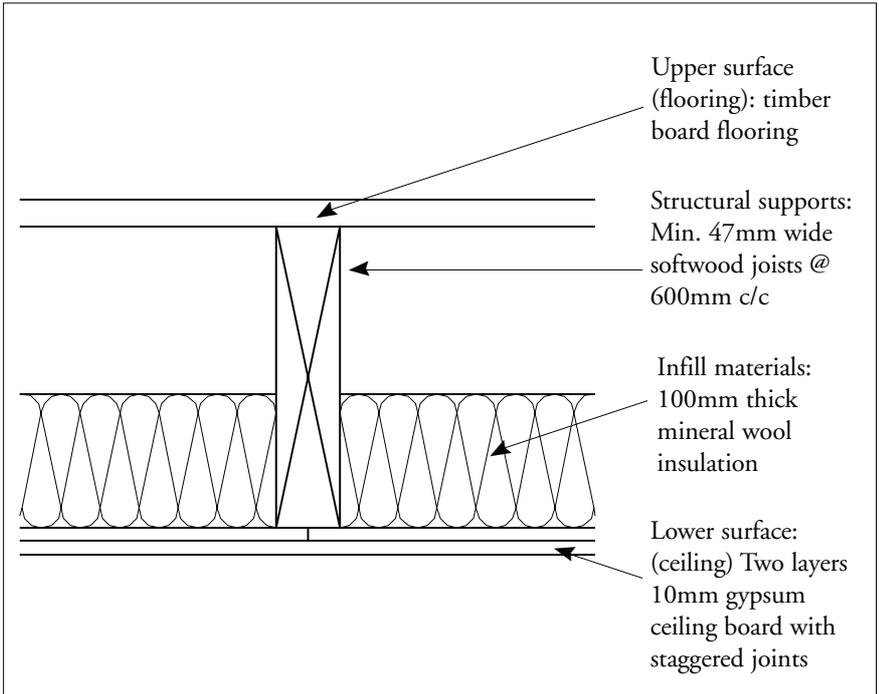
Typical 60 minute timber compartment floor with gypsum based board ceiling.
